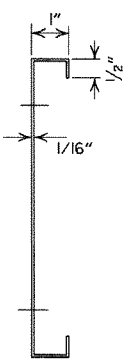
DETAIL OF TERMINAL ANCHOR POST (TYPE I)
